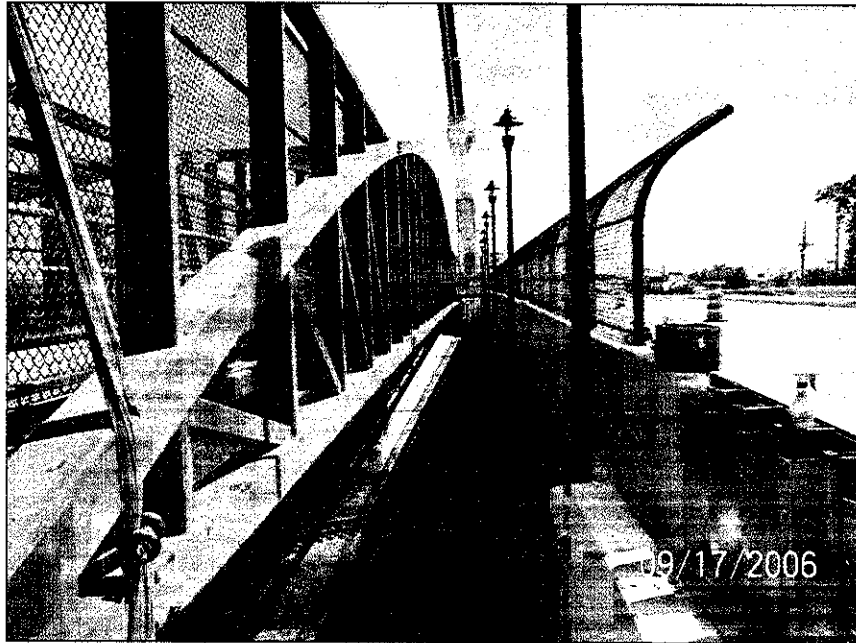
Example of Through Truss structure adjacent to SR 54 over CSX
